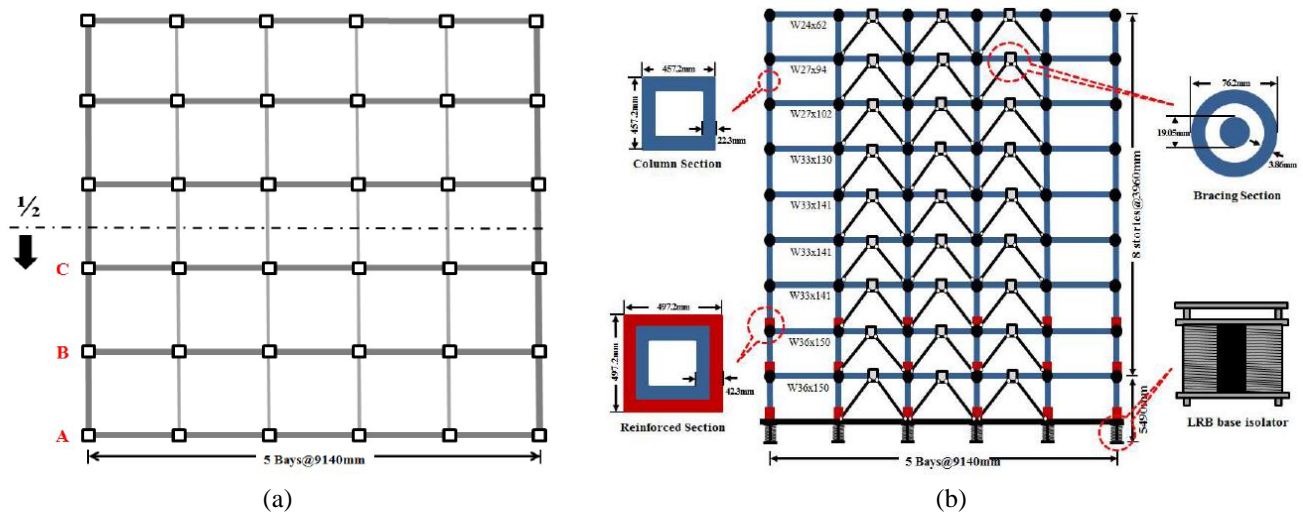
Model design system (a) plan and (b) view of model 5 components on frame A
